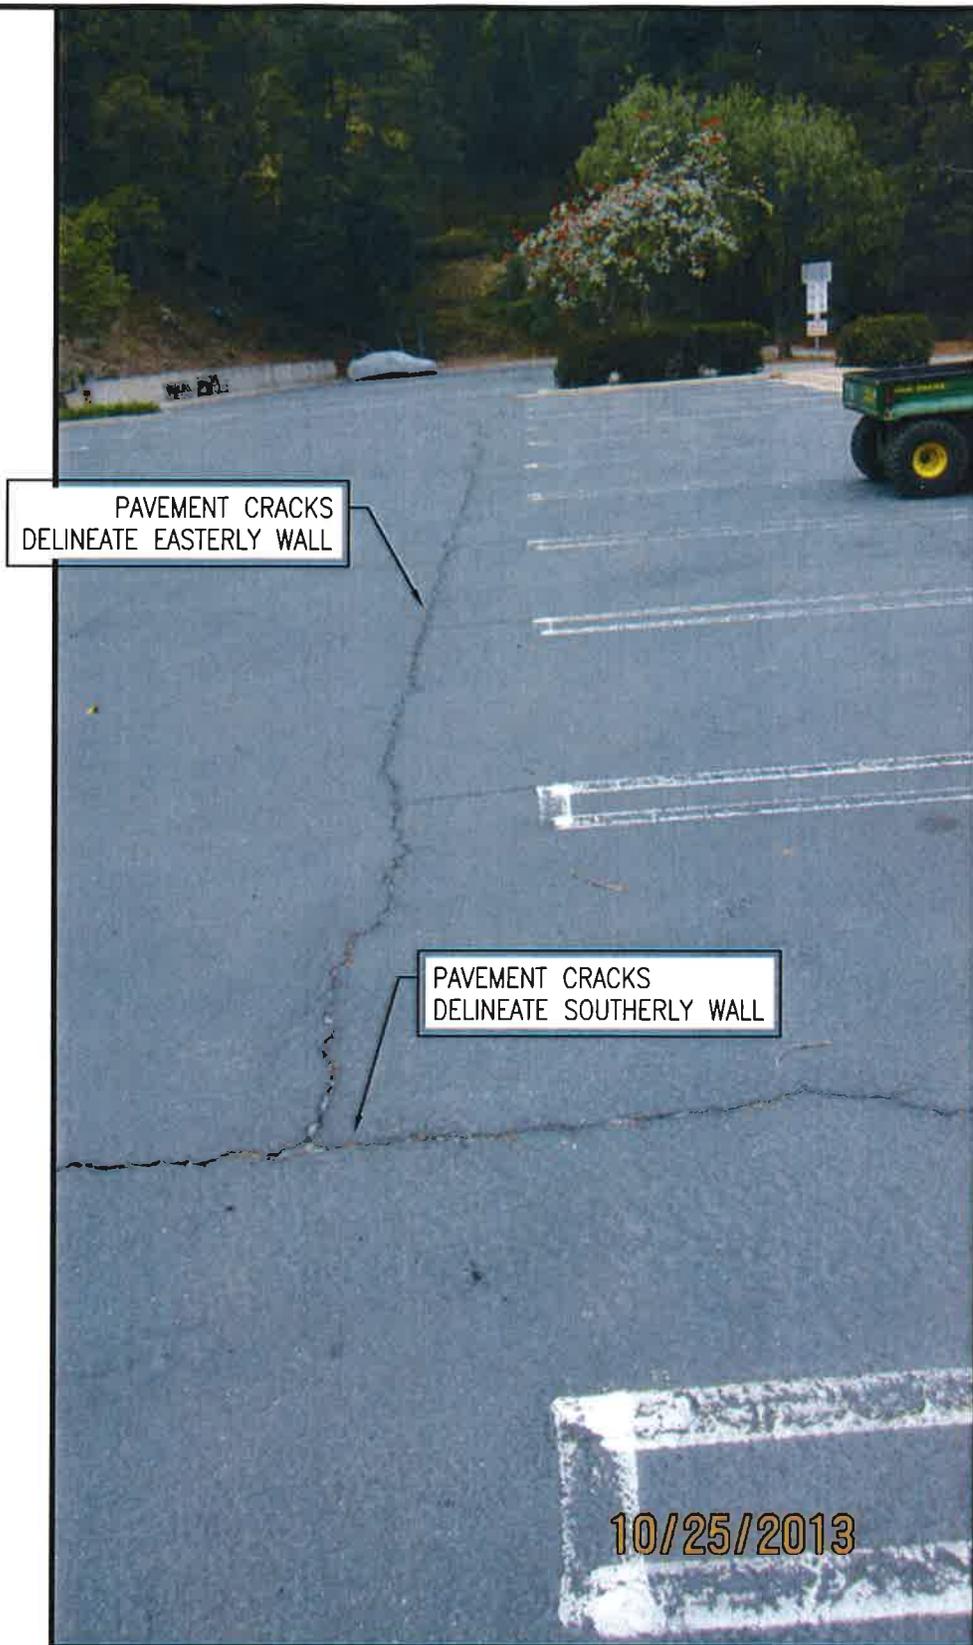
FIGURE L: PAVEMENT CRACKS AT SOUTHERLY AND EASTERLY BASIN WALLS
